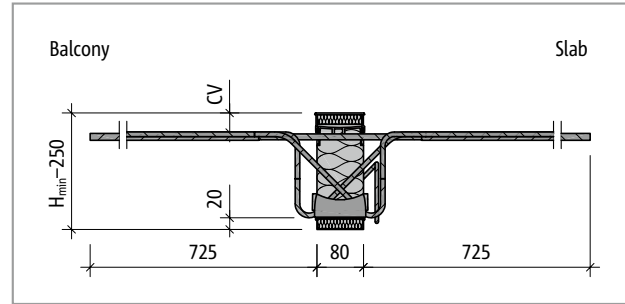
Schöck Isokorb® T type K-M6-VV1: Product section
